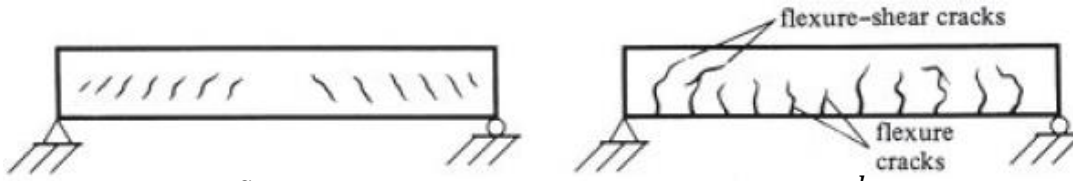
Inclined cracks: [a: web-shear cracks, b: flexure-shear crack].
